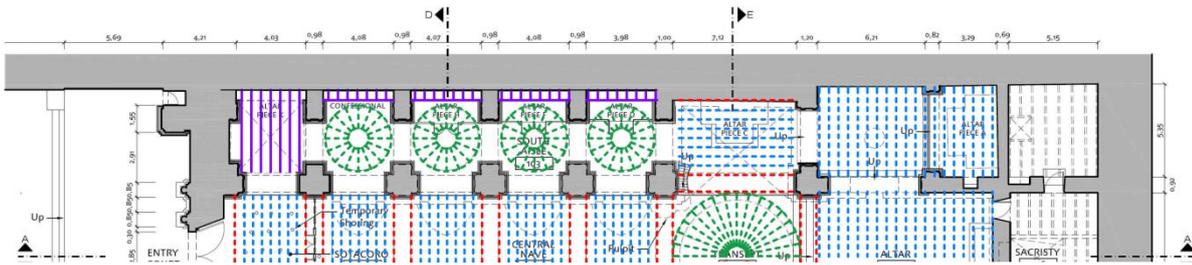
Couples of wooden frameworks between nave pillars (red), nave pillar and pilaster (blue) and pillar of the transept and pilaster (green).
